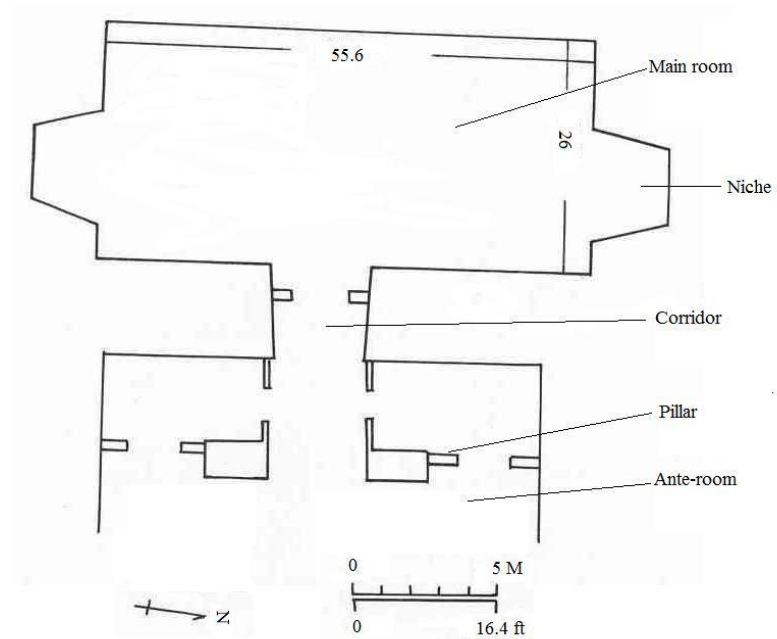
A floor plan of Cave 148. Source: Shih 1996: 30-31.
